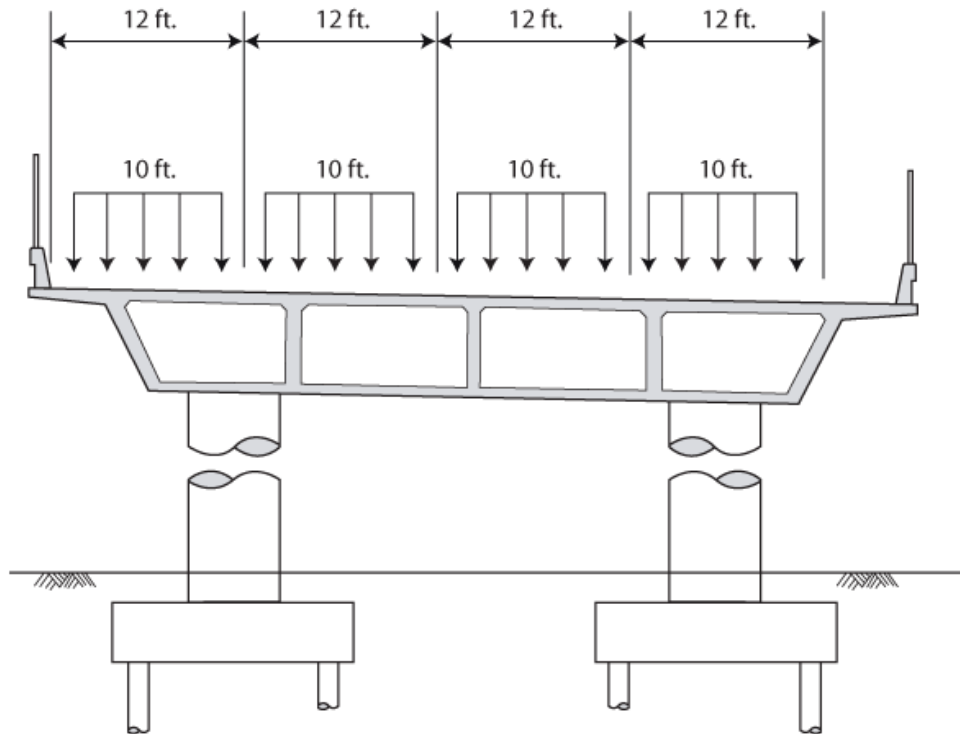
HL-93 Lane Loads Positioned Transversely
